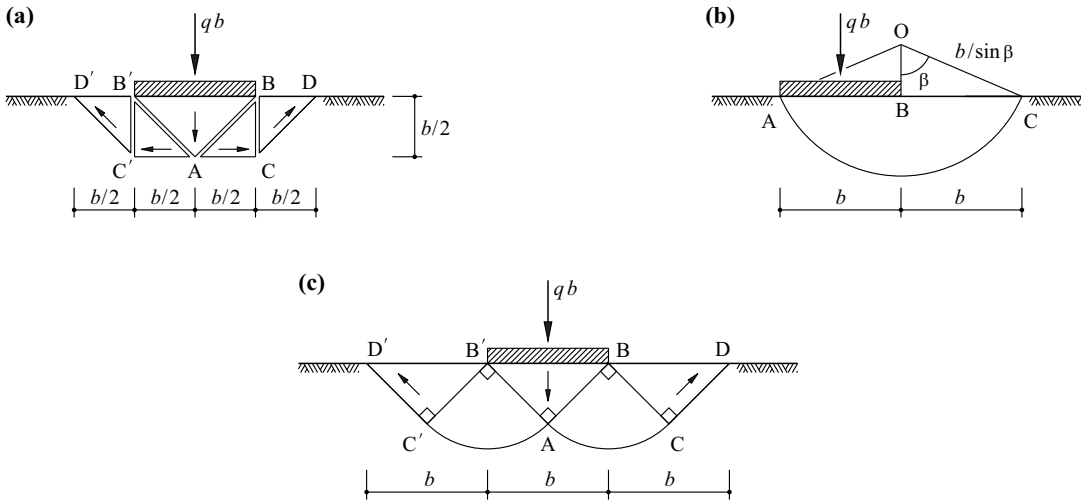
Failure mechanisms for a strip foundation on a weightless TRESCA half-space
